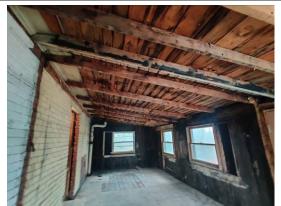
Standing in the east room on the second floor, looking north. Because the brick has already been installed on the main house, we know that this room is a later addition.
